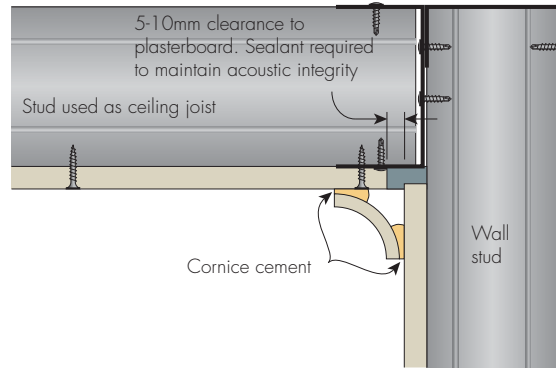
Non-Trafficable Ceiling to Plasterboard Wall
